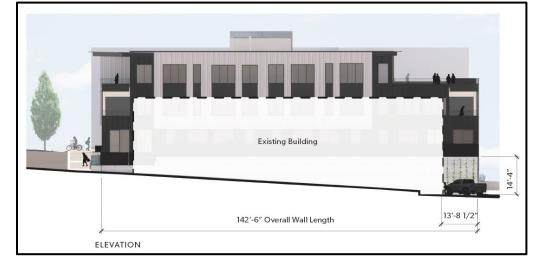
Interior Side Wall with Adjacent Office Building (Project Plans Page 66)
